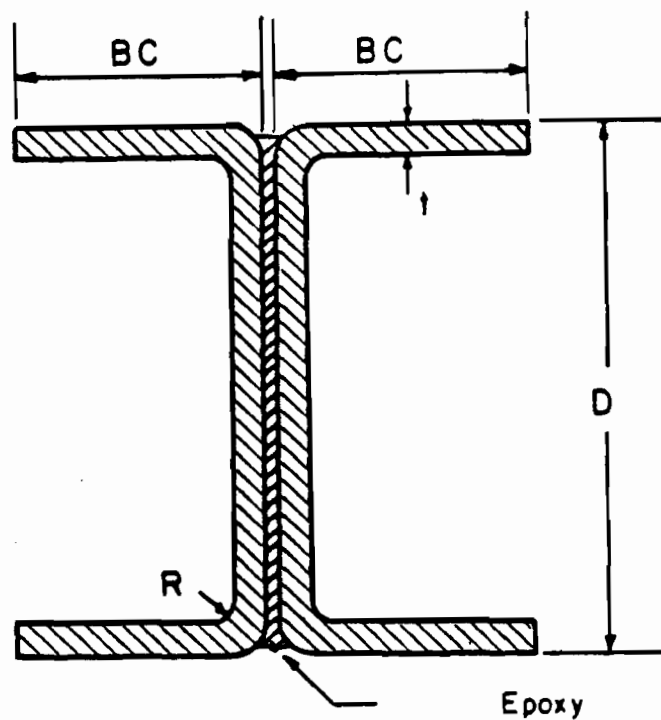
Cross Sections of I-Shaped Stub Columns
